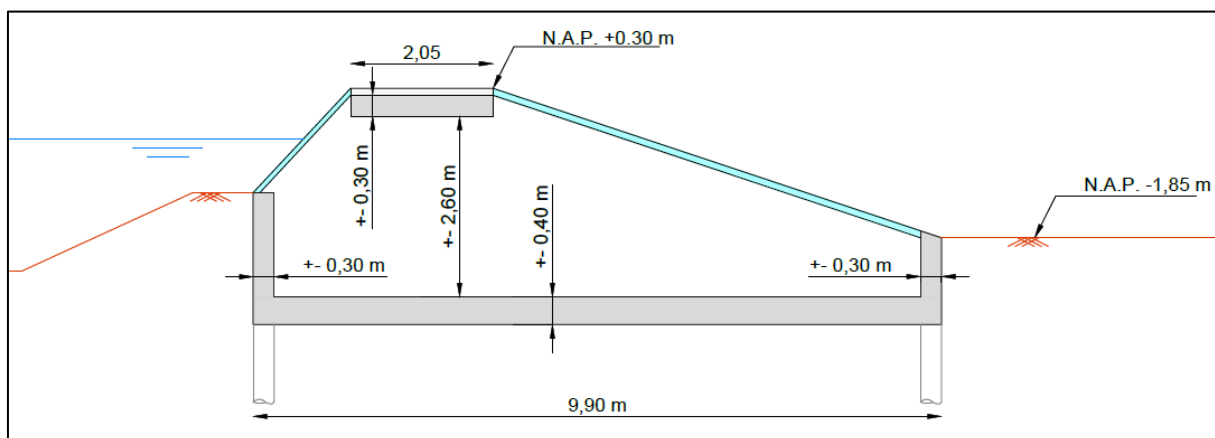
Preliminary dimensions in a cross-section of the glass dike
